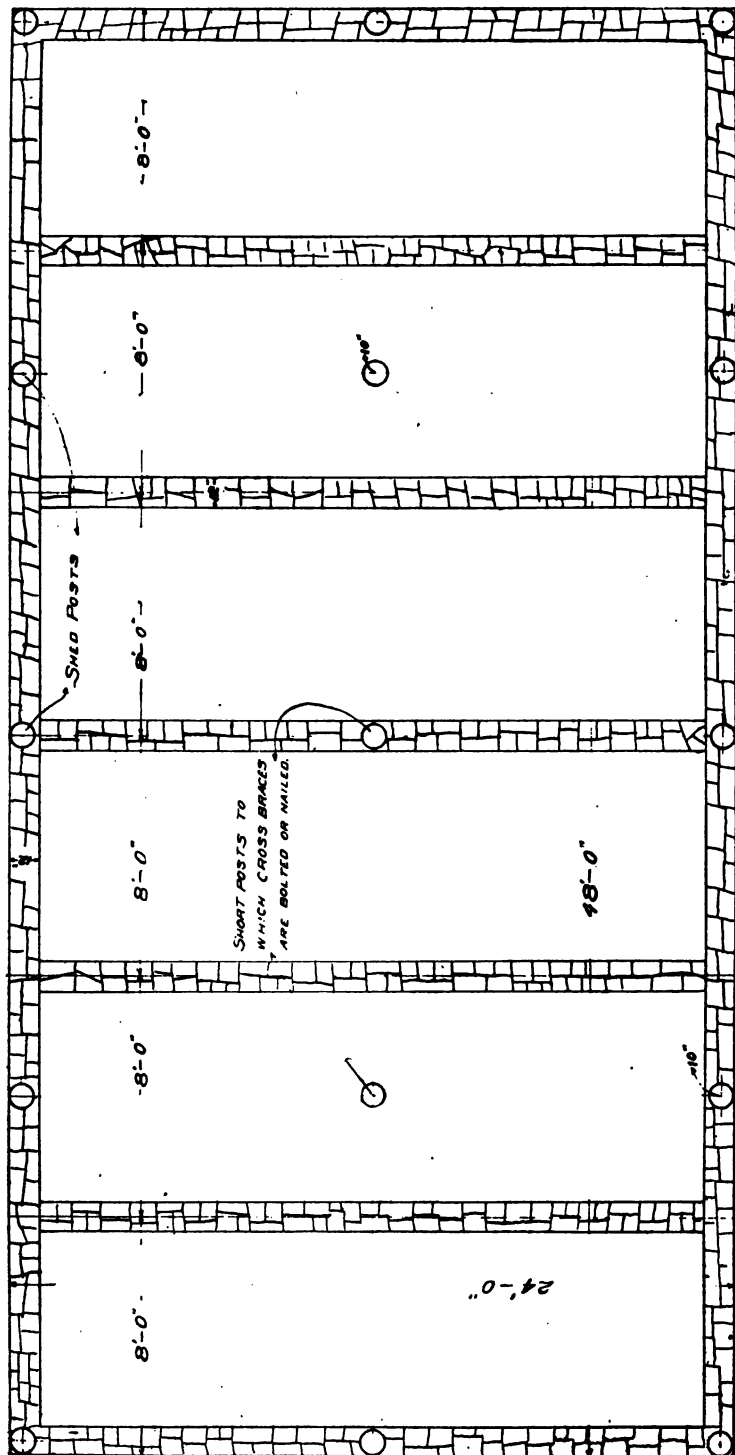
Ground plan of hay barn. (Walls do not extend lengthwise of shed, as shown in plan, but the spaces between cross-walls are left open for ventilation.) [Courtesy Kansas Experiment Station.]
